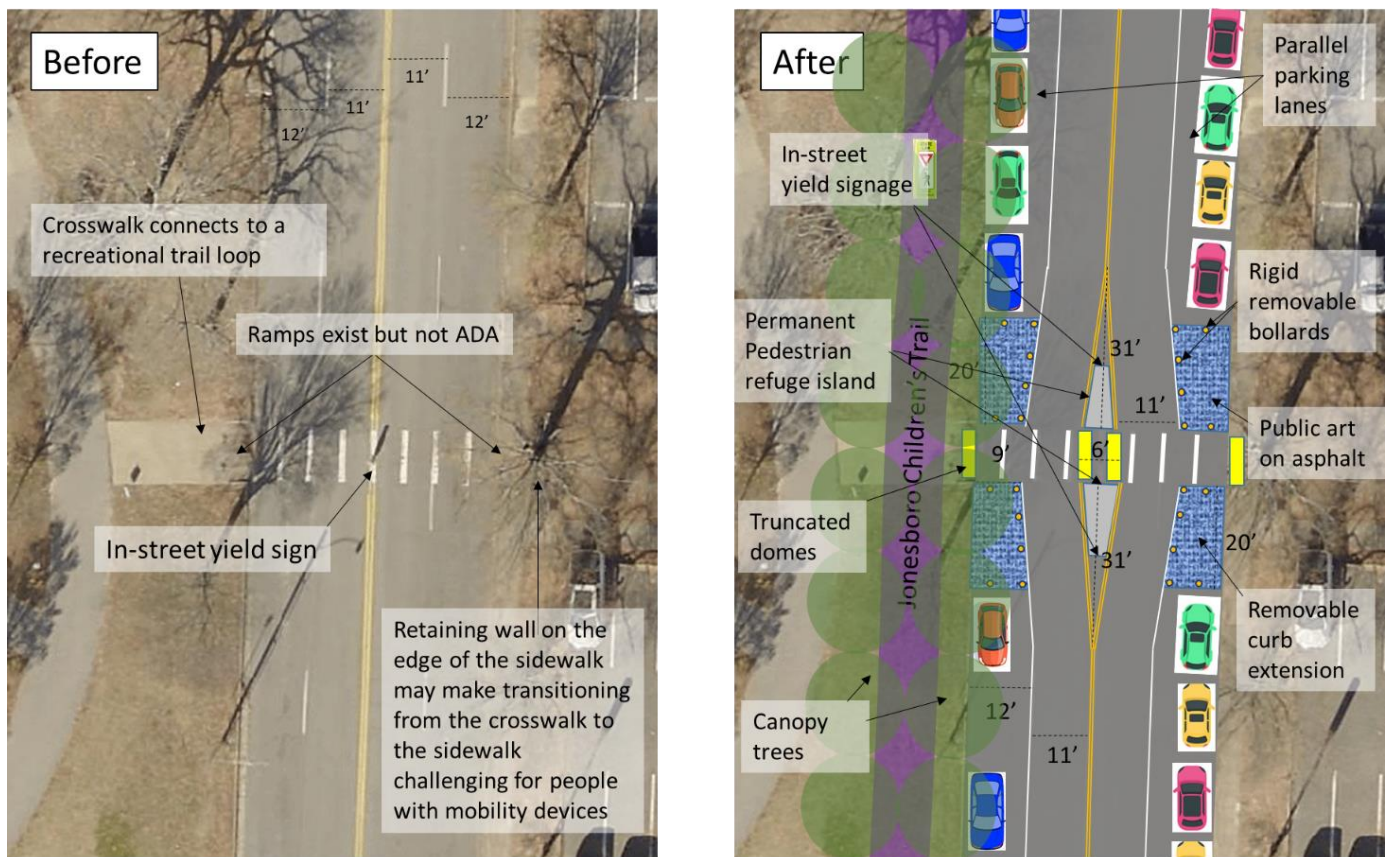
Crosswalk #2, existing conditions (Before) and proposed infrastructure (After).
